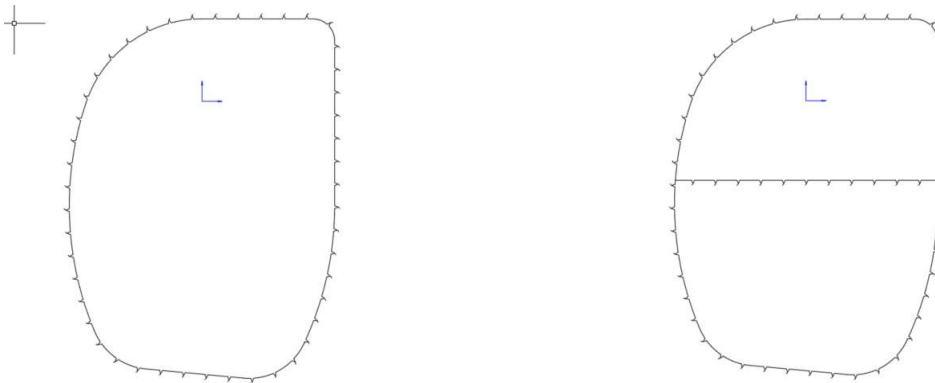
Tunnel type 6 - Full face or phase 1 and 2 excavation
